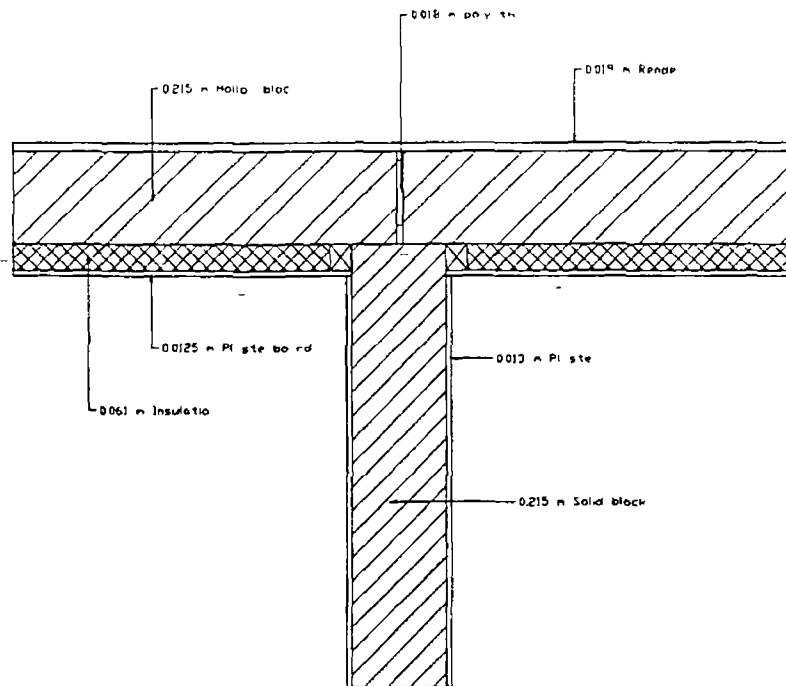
11 2 ANSYS Representation of Semi-Detached Party Wall and External Wall
